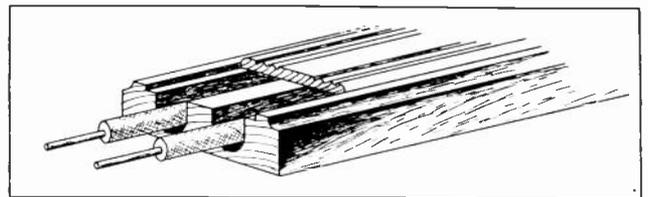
A piece of wood moulding of the type sometimes used in making additions to old systems of this type.
